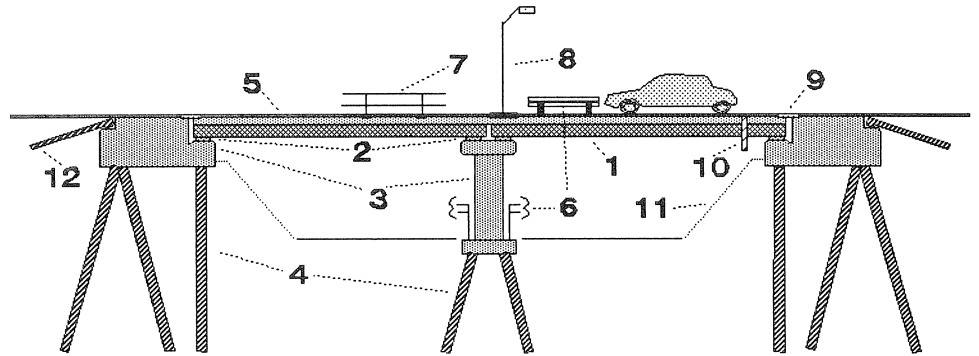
The (main) parts of a viaduct: 1. Main bearing structure (beams and slab); 2. Rubber bearings; 3. Support points (abutments and intermediate piers); 4. Foundation structures; 5. Asphalt wearing course; 6. Guide rails or crash barriers; 7. Parapets; 8. Lighting; 9. Expansion joints; 10. Rainwater drains; 11. Soil-retaining structure or covered slope; 12. Traffic impact or approach slabs.
